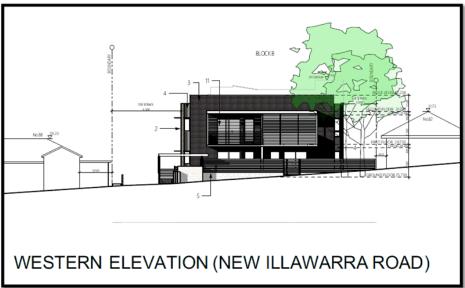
DA-2017/371 – Elevations of 84 New Illawarra Road, Bexley North
